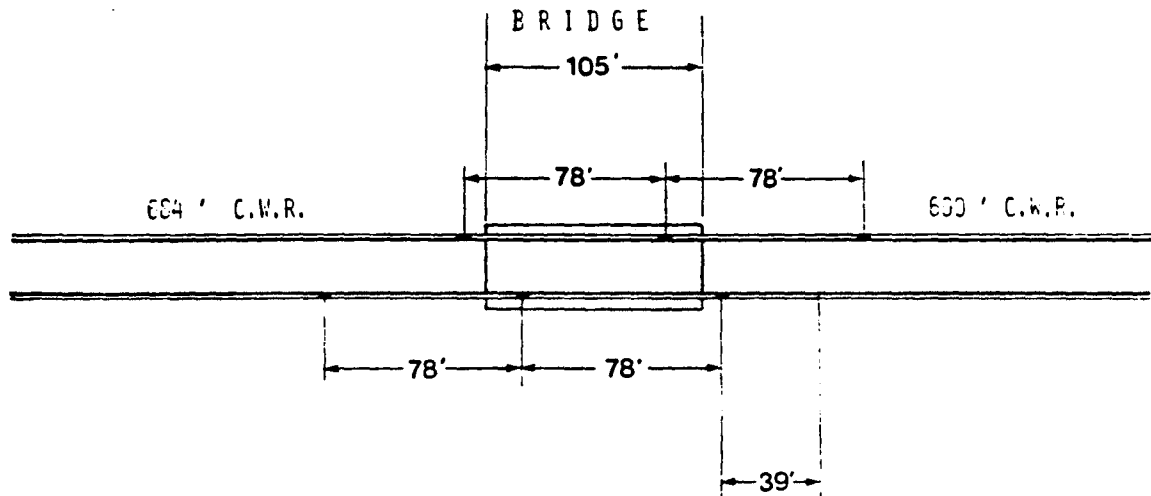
LAYING RAIL ON BRIDGES LESS THAN 150'
